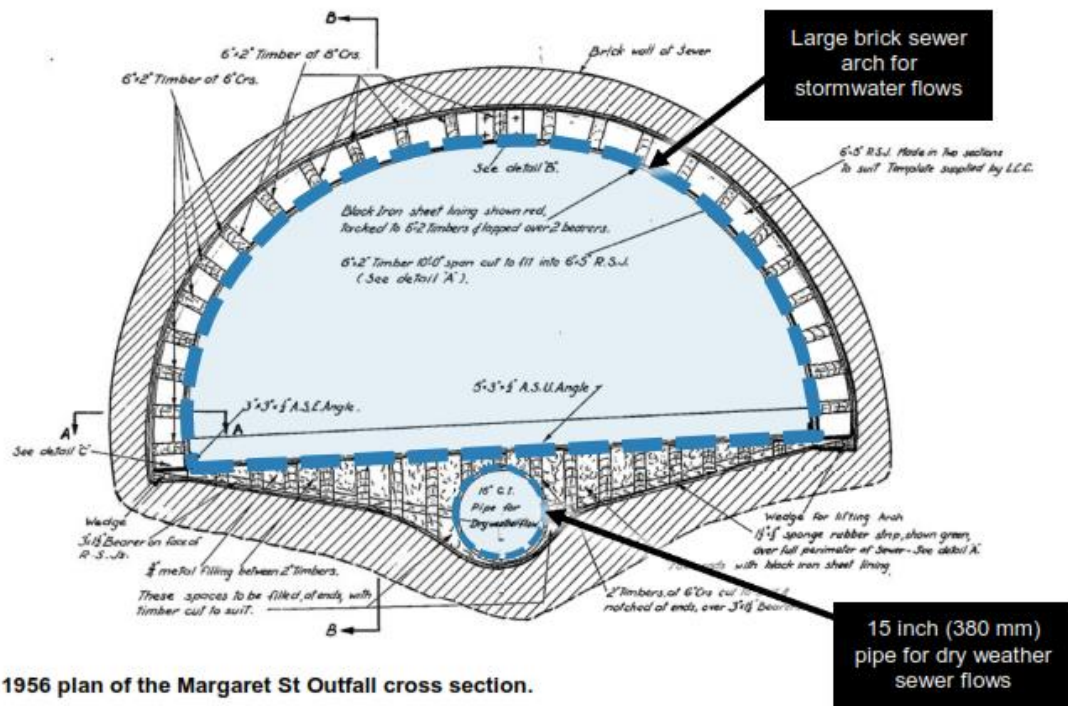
Cross Section of the Margaret Street Brick Barrel Outfall
